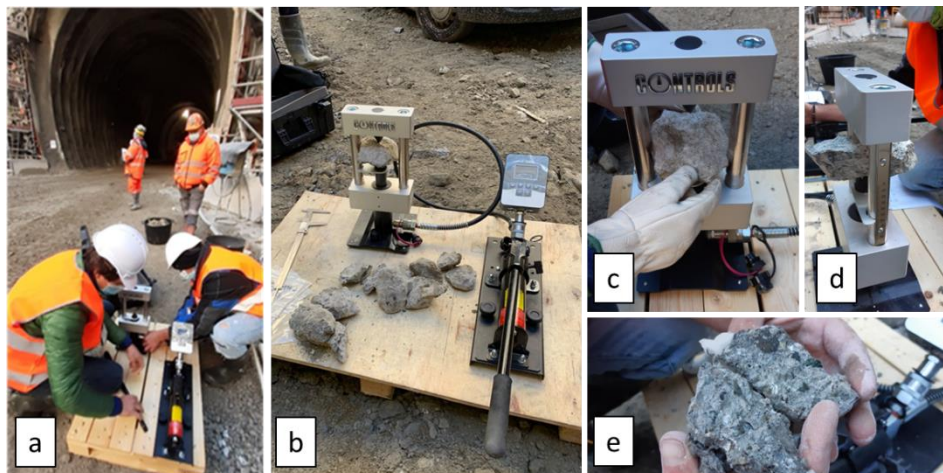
On-site point load tests execution on frozen blocks: a) in the shaft in front of the tunnel; b) PLT equipment; c) gloves for cryogenic use; d) frozen block located between cones; e) cracks faces of frozen block post-failure.
